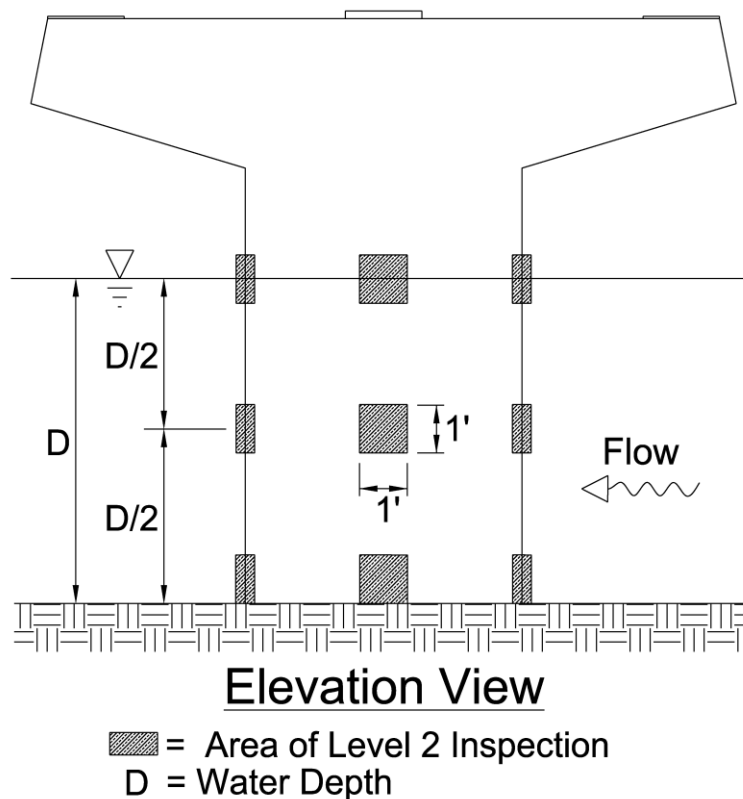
Illustration. Locations of Level 2 inspection areas on a bridge pier wall.
